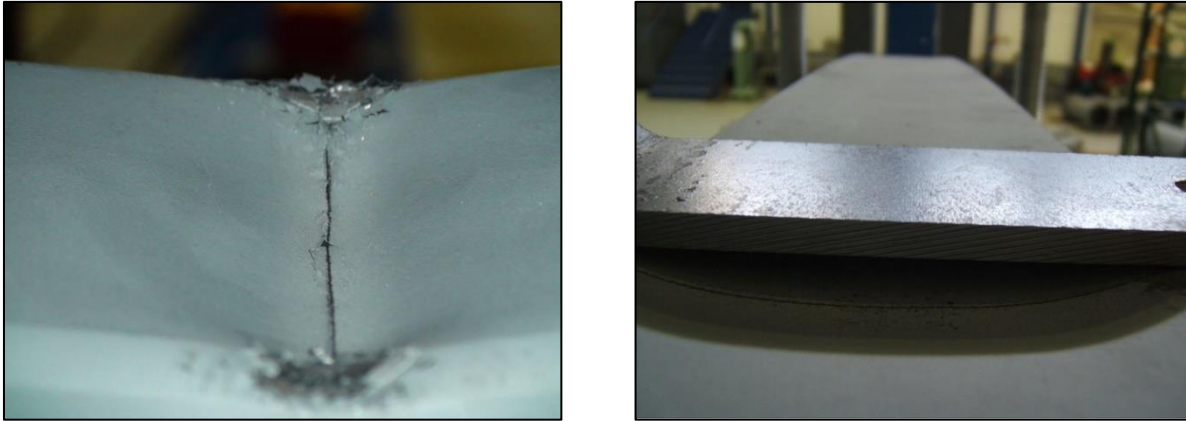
Fracture at the top flange of Sp. 9.
